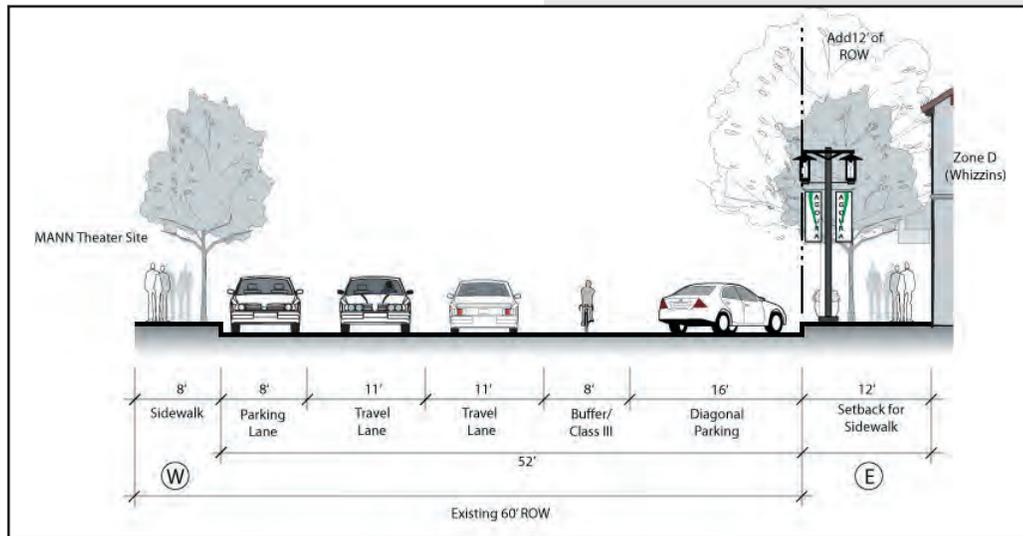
Future Cornell Road street section (north of Agoura Road)
